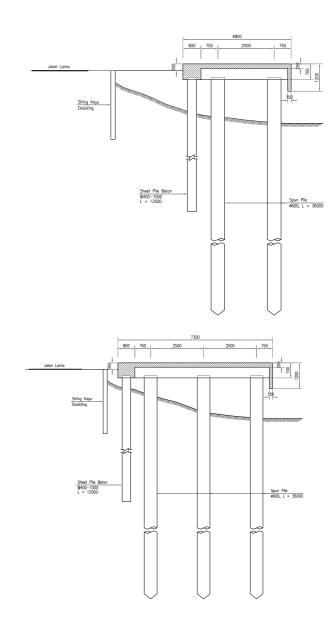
Site Plan of Construction System of Deck on Pile at Region A
